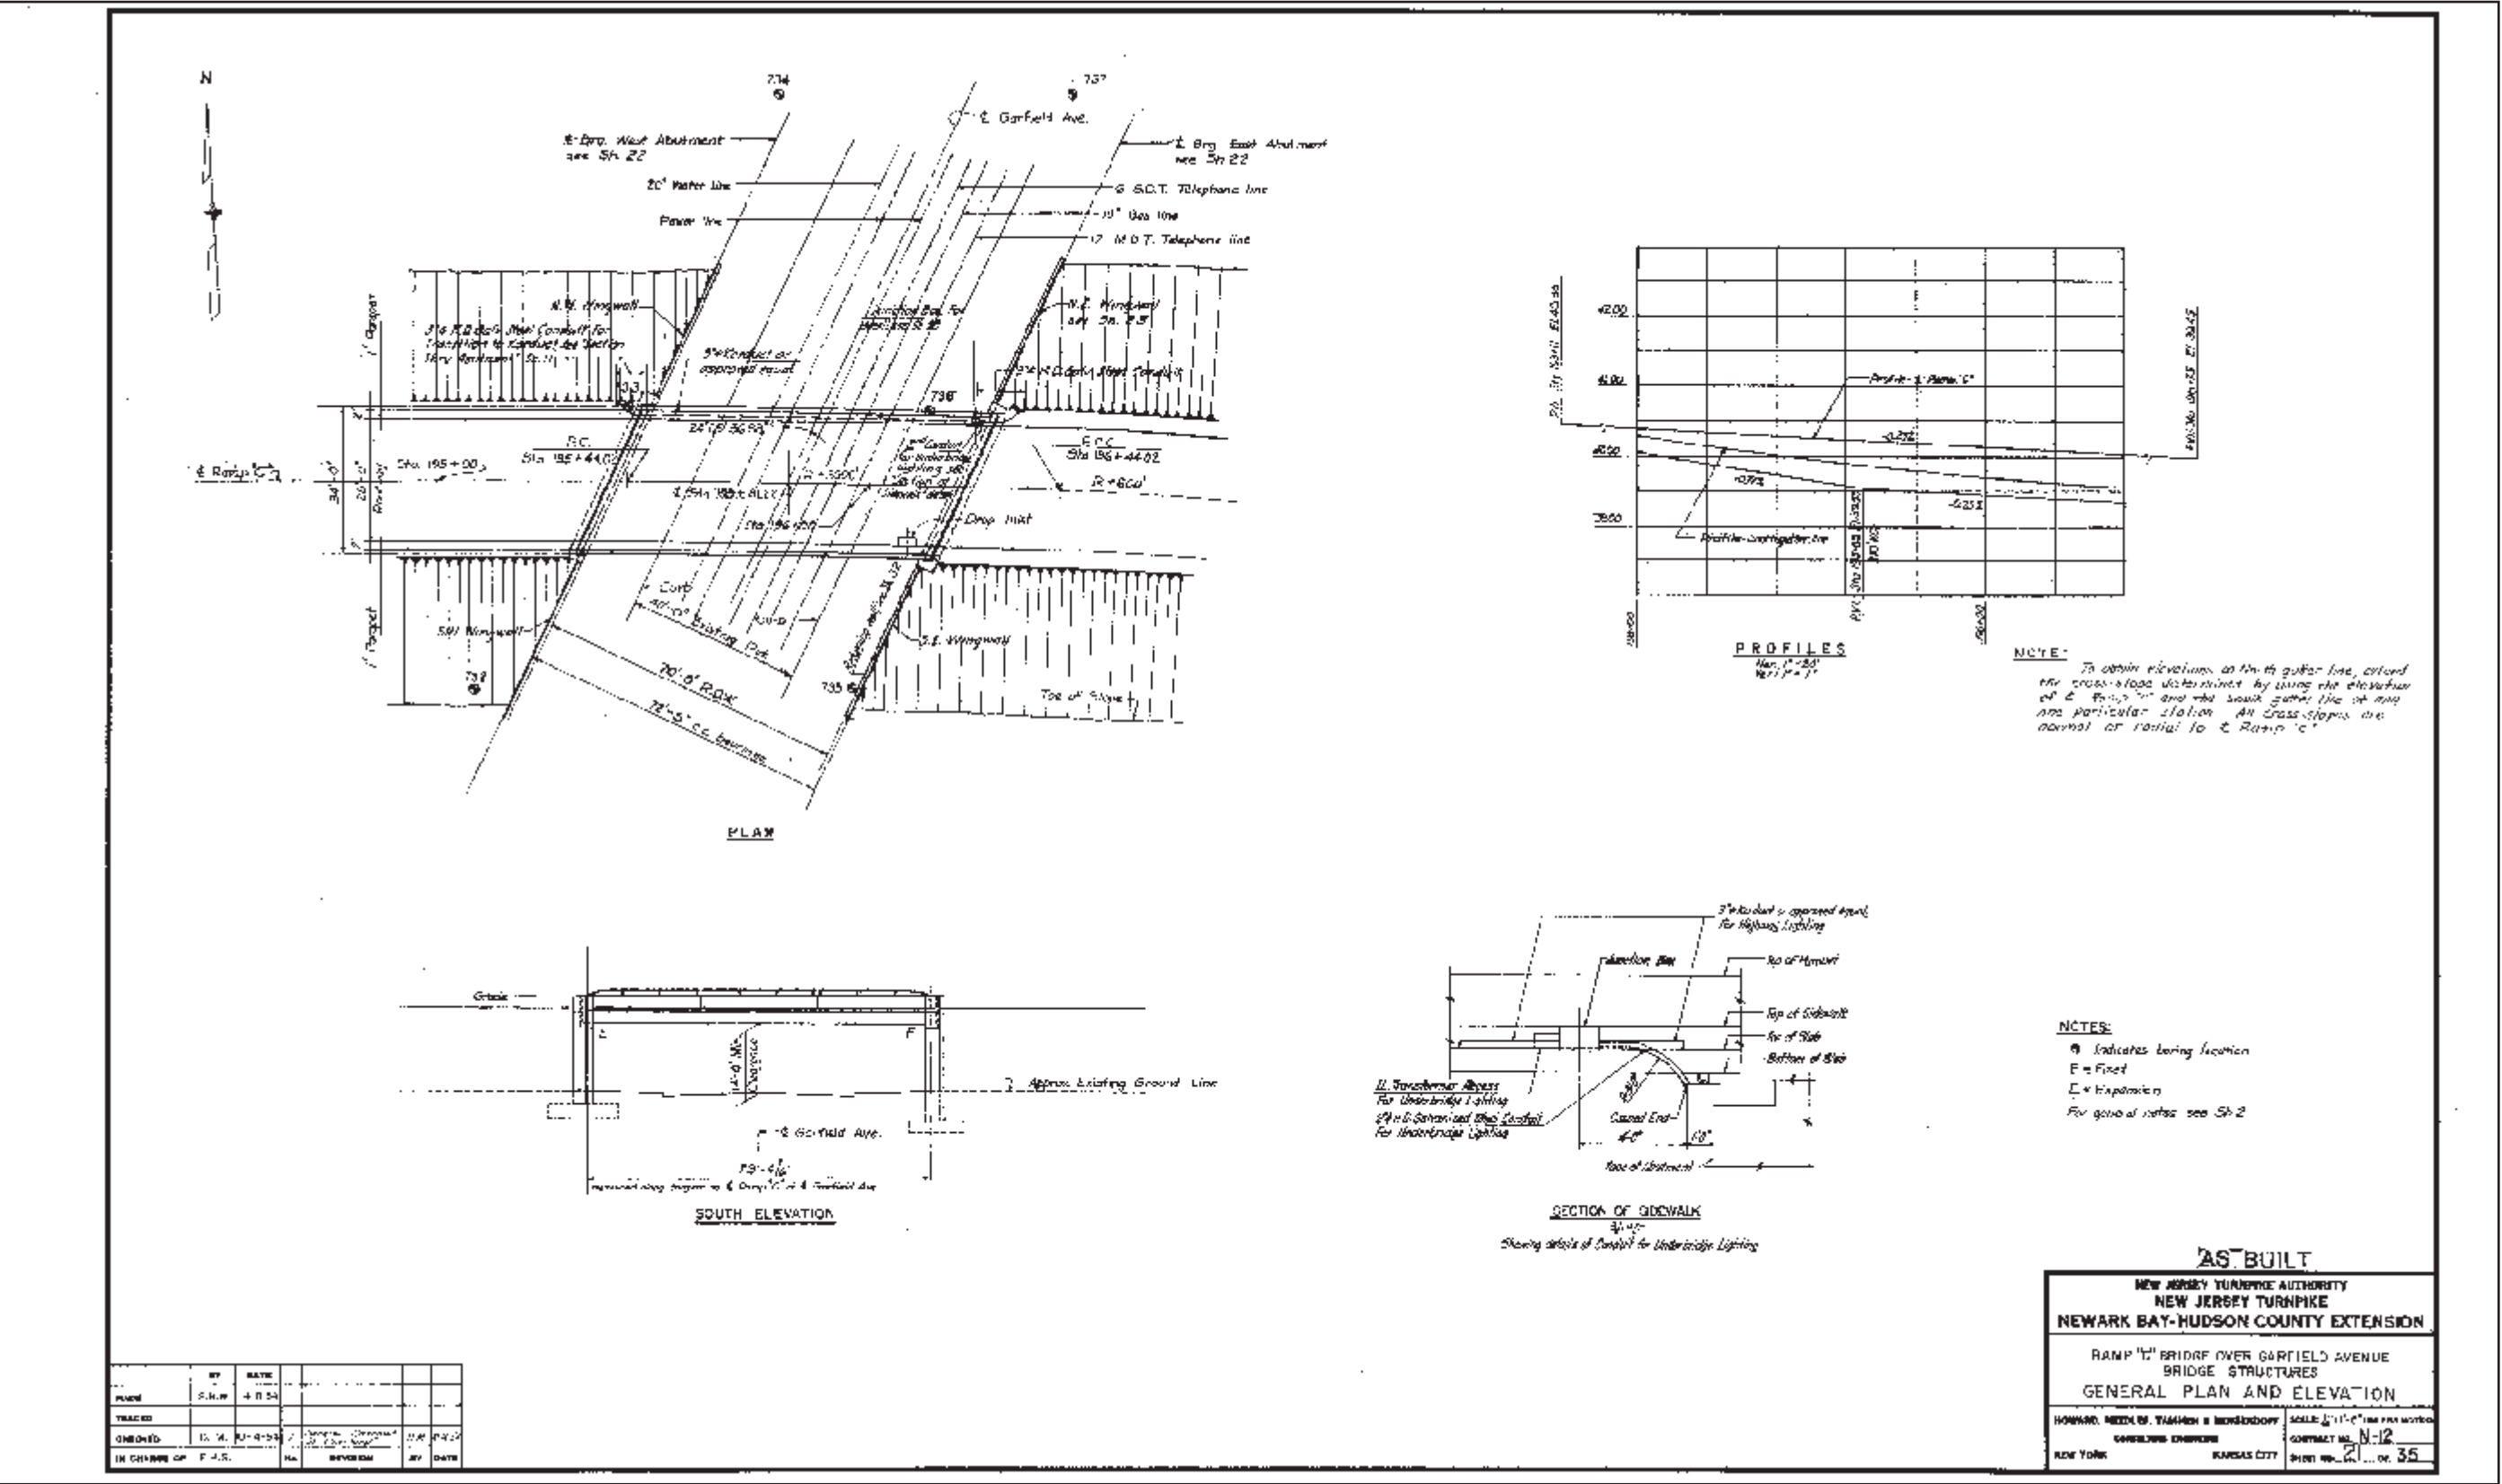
1954 as-built construction drawing showing the general plan and elevation of the Ramp C Bridge over Garfield Avenue (HNTB 1954c).
